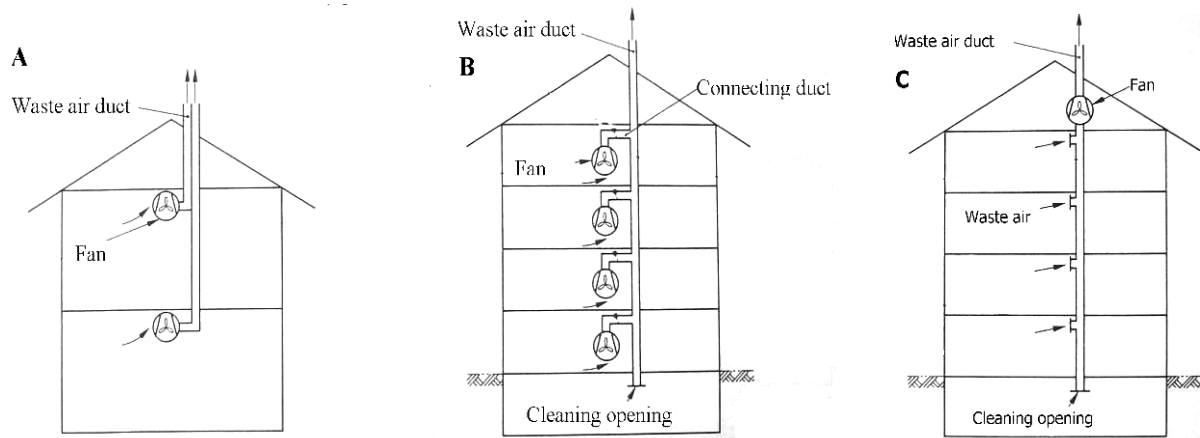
Schemes of Exhaust only ventilation system.[33] A) Single exhaust only ventilation system with separated waste ducts. B) Single exhaust only ventilation system with common waste air duct. C) Central exhaust only ventilation system with a common changeable volume flow
